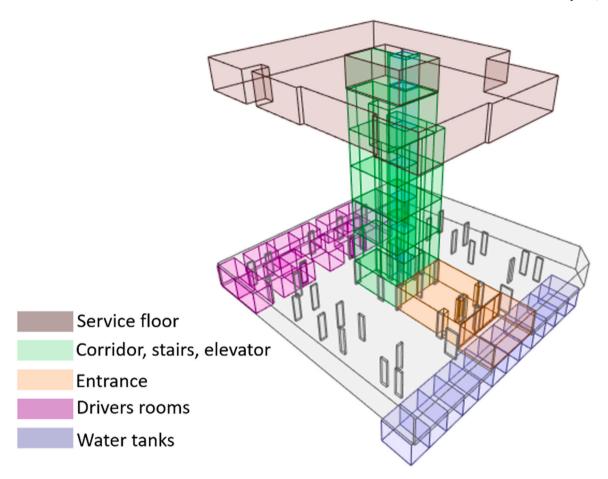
The common spaces of the building including parking floor, drivers' rooms, and water tanks.
